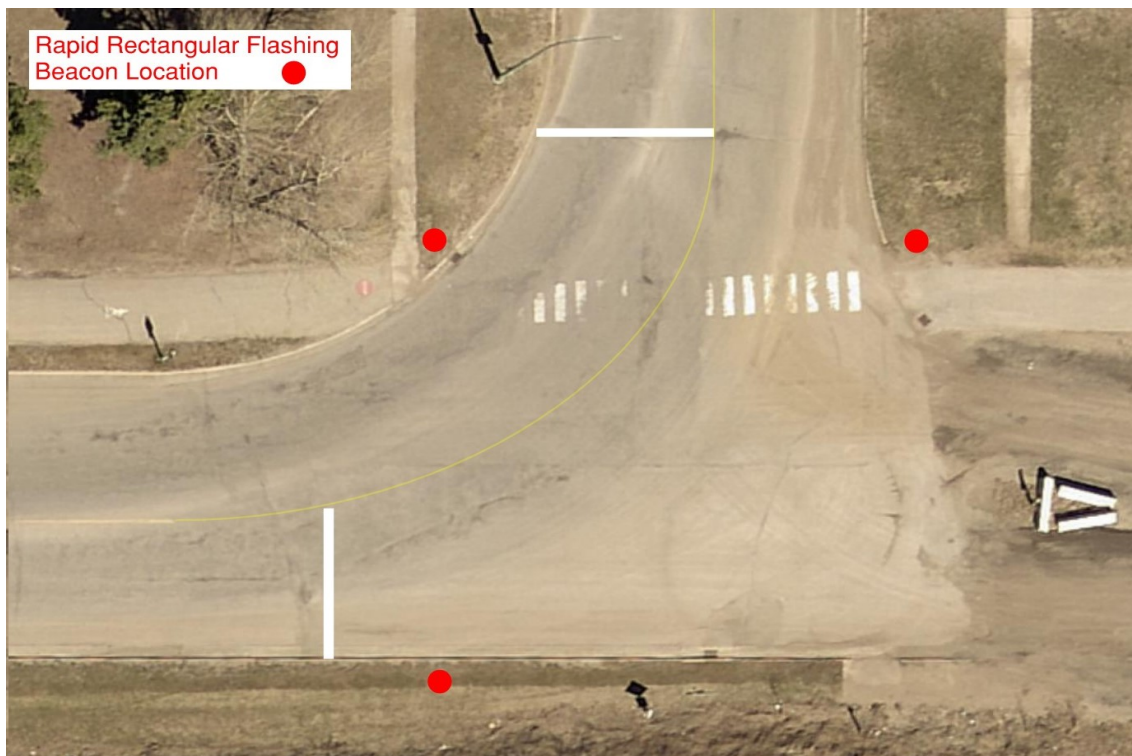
Option the Recommendation - Rapid Rectangular Flashing Beacon Locations
